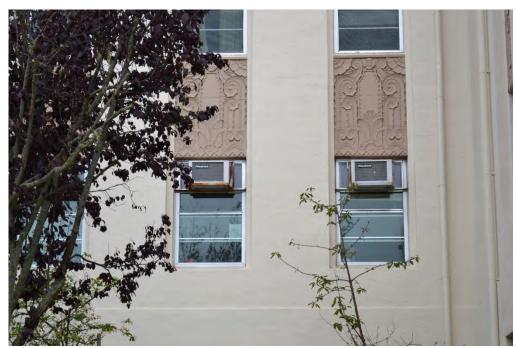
Photo of non-historic window units installed in the non-historic windows at Building 1 (photo by HHM, 2014).
